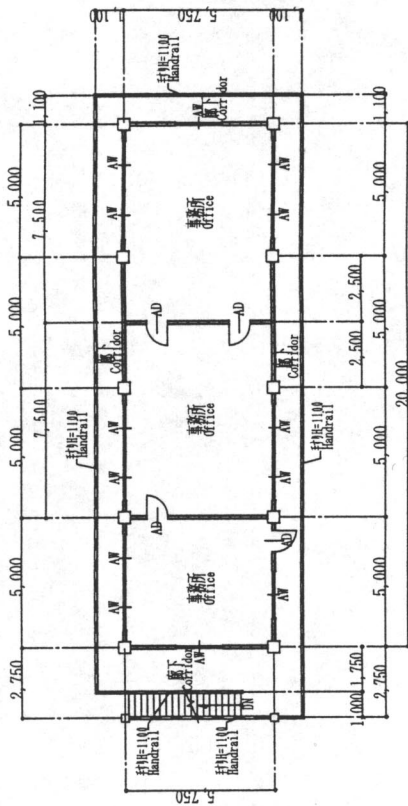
Ground Plan and Elevation Plan of Storehouse and
